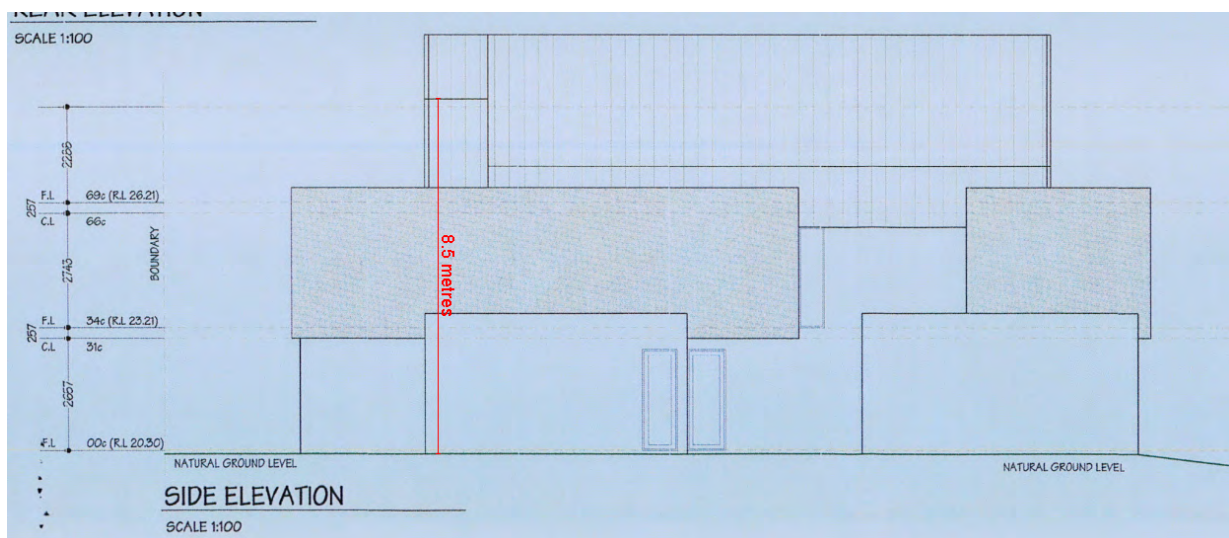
West elevation of 38 Mathieson Avenue, depicting a 8.5m external wall height
